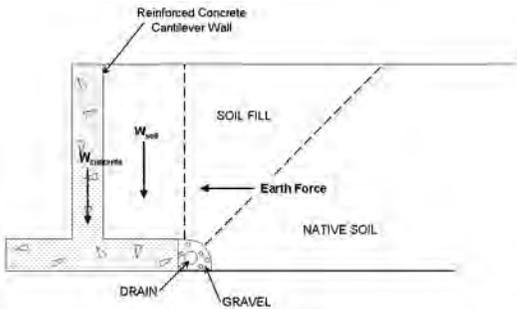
Cantilever Soil and Concrete Weight Resists Overturning Earth Force
